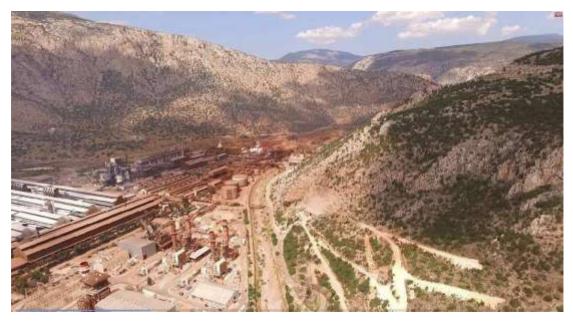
Panoramic view of the wider deelopment area of the new power station and construction sites
